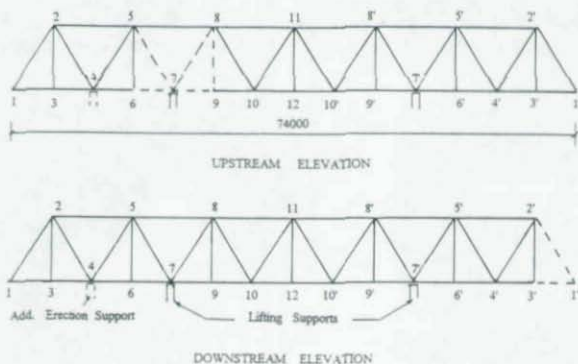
OUTLINE OF STEEL BRIDGE
